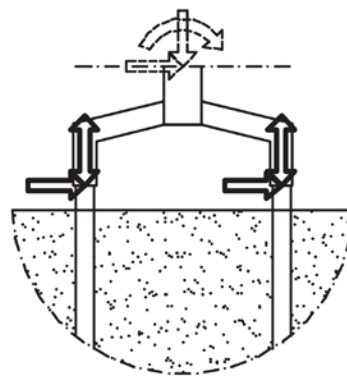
Load configuration of a sub-structure with multipod foundation.
